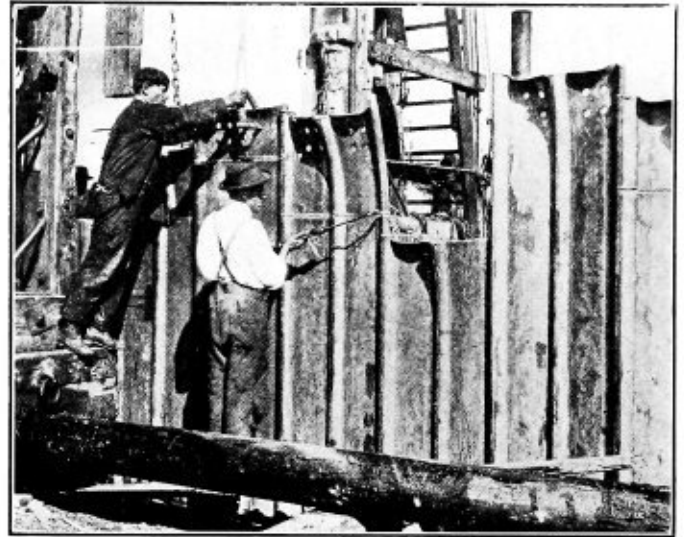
Cutting Steel Sheet Piles with Oxy-Acetylene Torch
